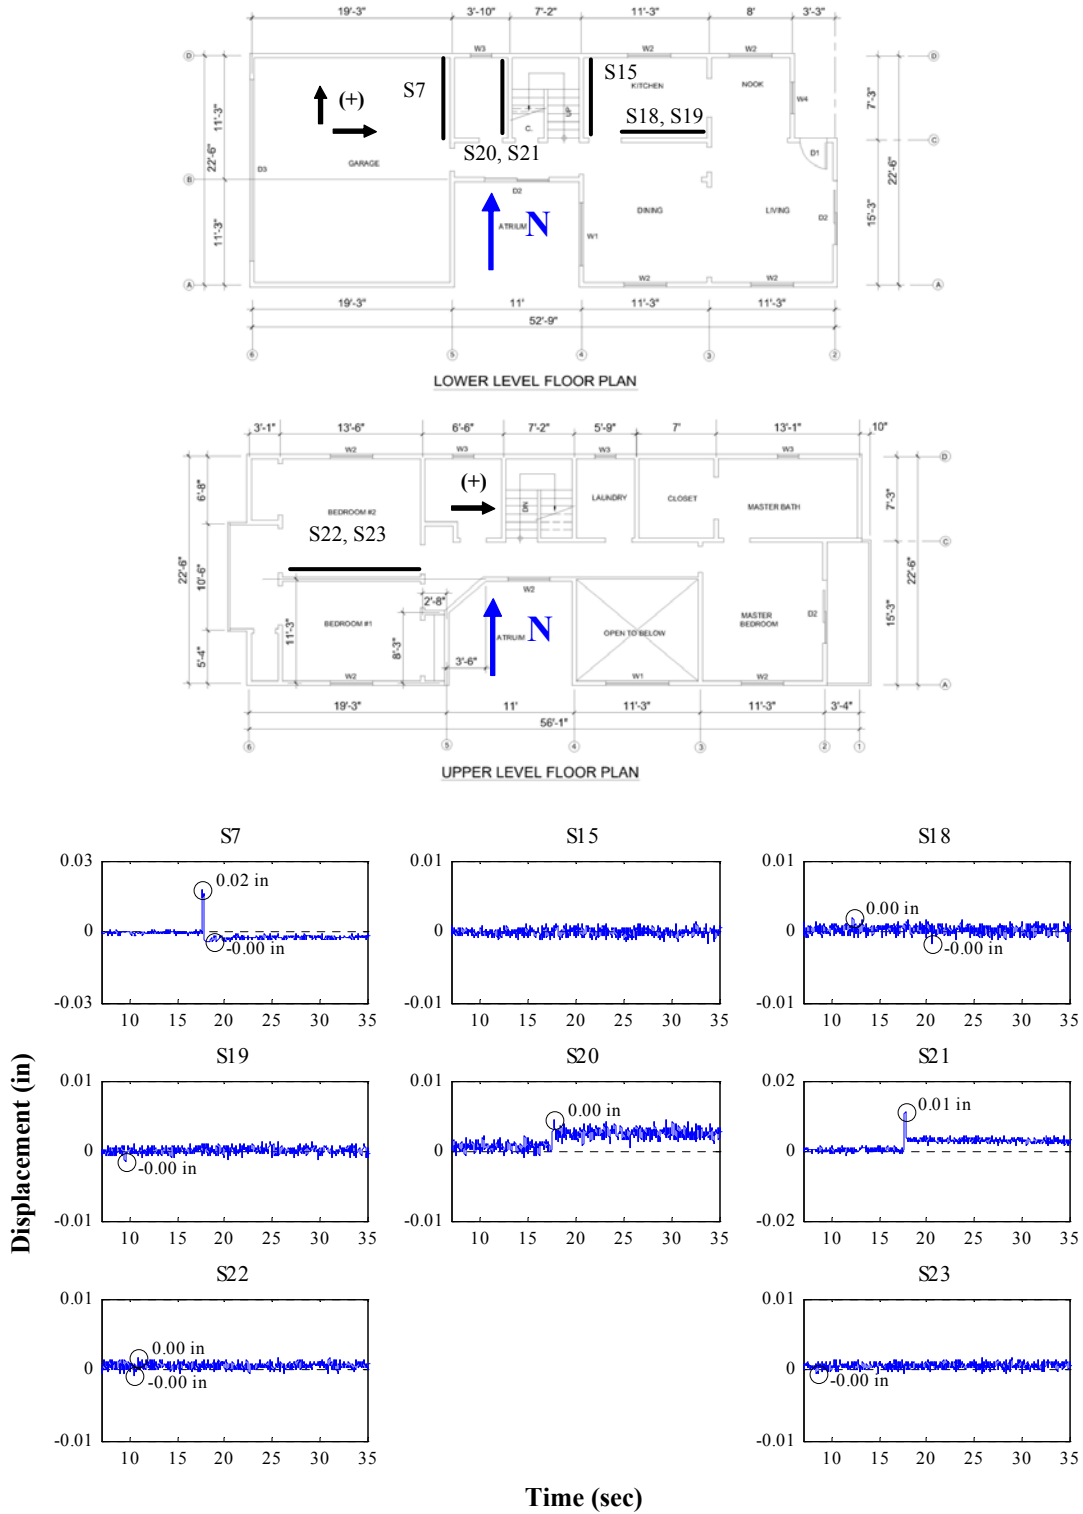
Wall deformations of internal walls for Test NWP1S04
